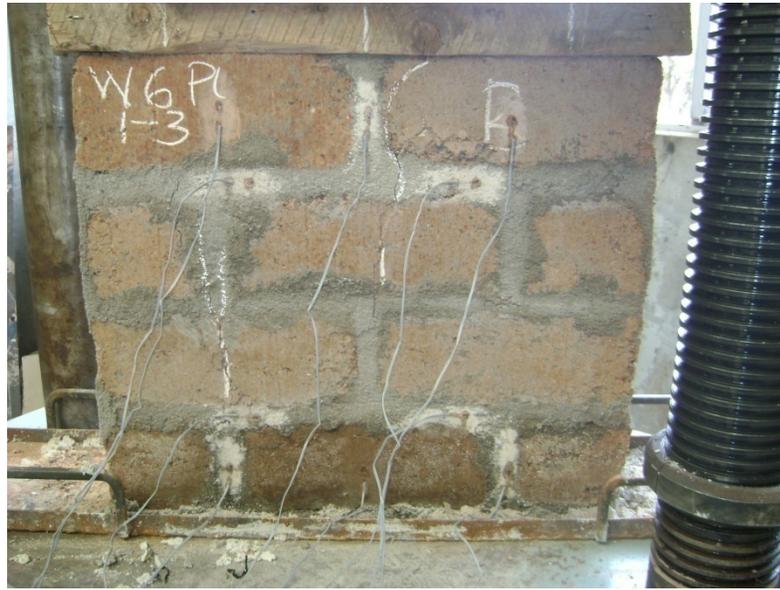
Cracking pattern for plain conventional block wall utilizing 1:3 jointing mortar
